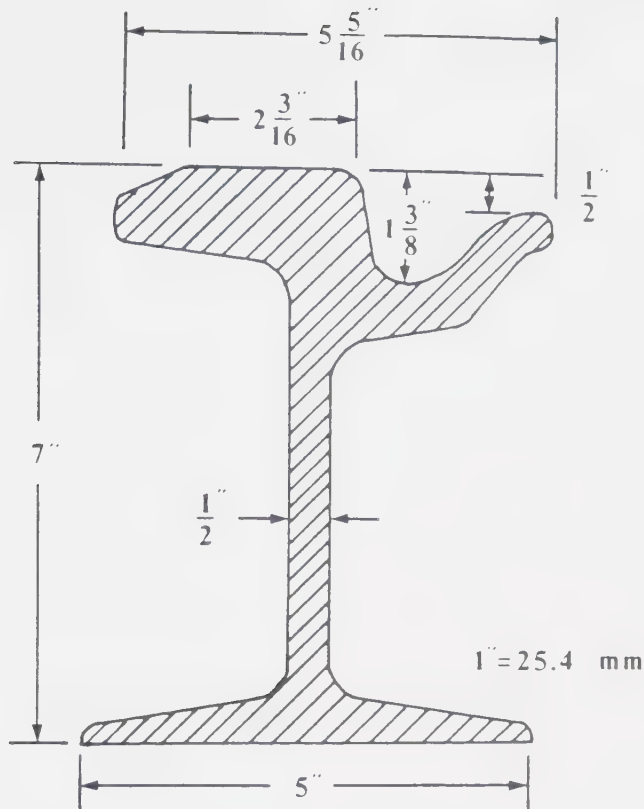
CROSS-SECTION OF 103-478 AND 103-287A GROOVED GIRDER RAILS
